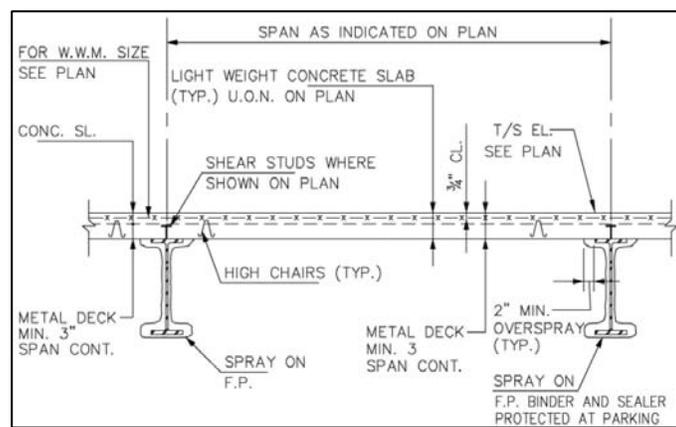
Typical Floor Construction , Metal Deck Perpendicular to Floor Beams on Girders
